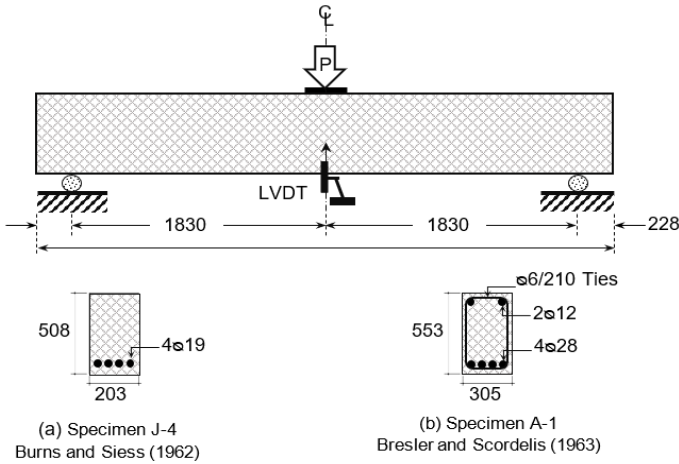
Geometrical and reinforcement details of the beams under three-point bending: (dimensions in 'mm')
